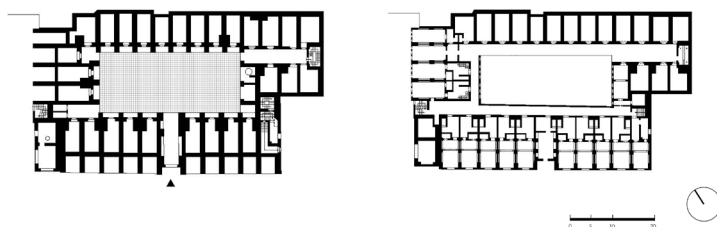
Ground floor and first floor plan of the Wikala Sultan Qaytbay (Manlio Michieletto, 2025)
